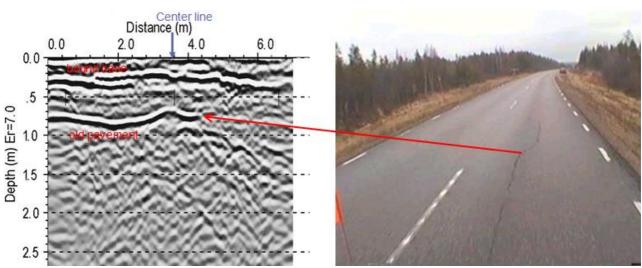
Old pavement inside the road structure causing reflection cracking, an example from Sweden
